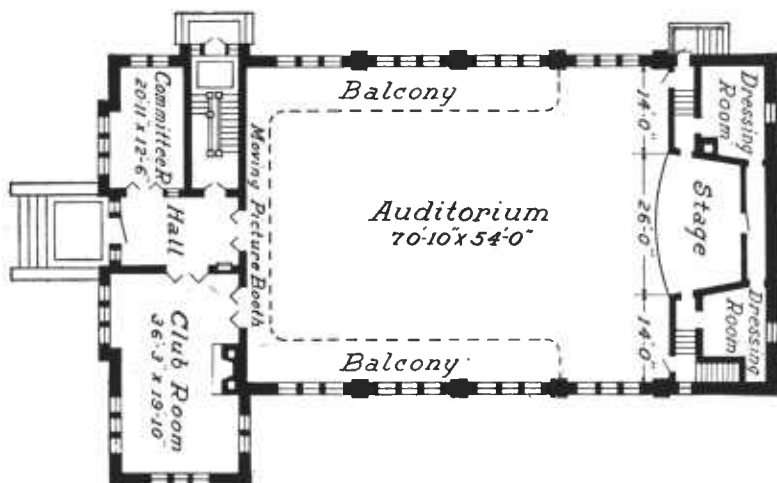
Floor plan of Brimfield building. (By courtesy of Robert J. Hotchkiss, architect.)
